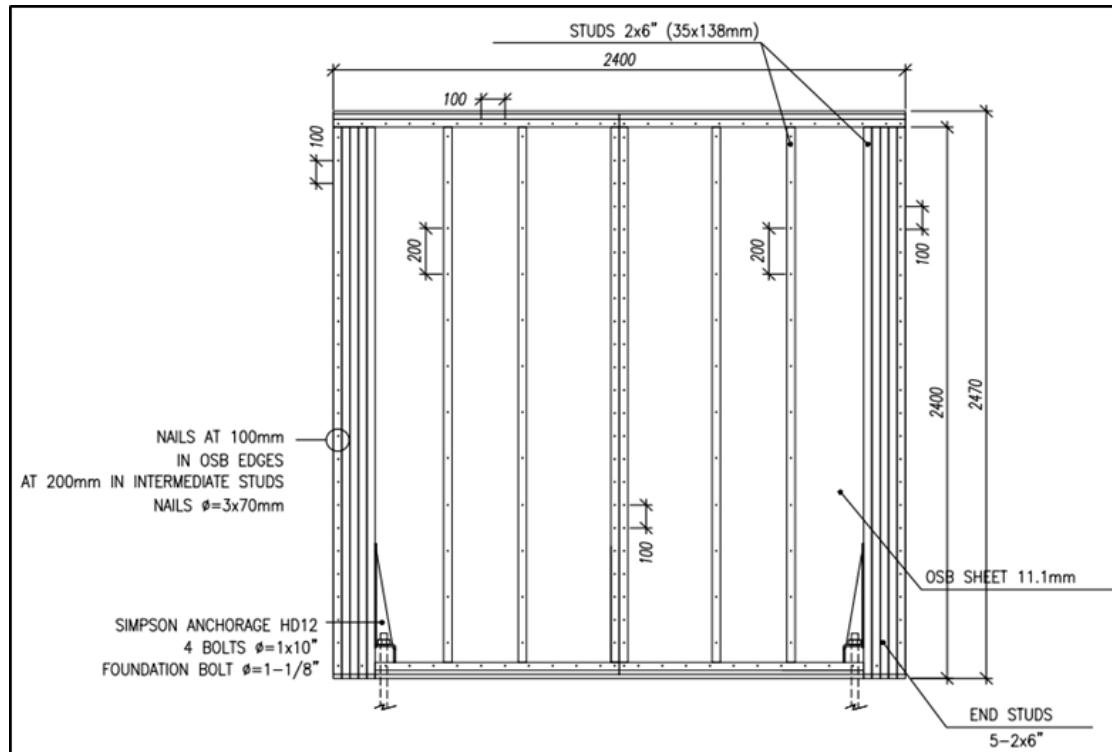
Configuration of a 2400 mm shear wall (lengths in millimetres).
